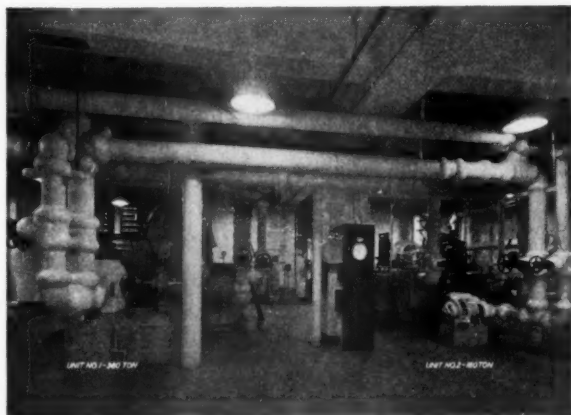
MOTOR DRIVEN CENTRIFUGAL MACHINES DESIGNED FOR CHILLED WATER SERVICE
